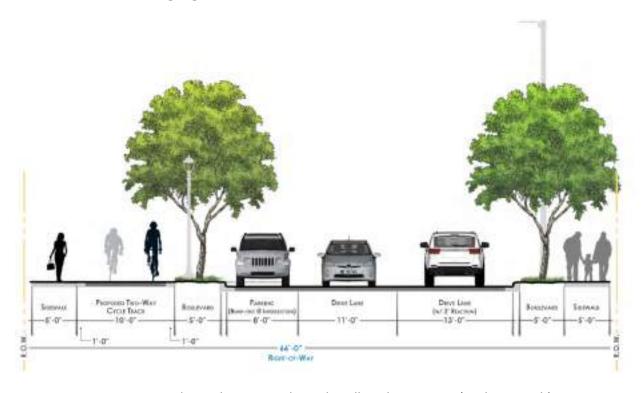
Cycle Track Connected to Sidewalk – Alternative A (Looking North)
